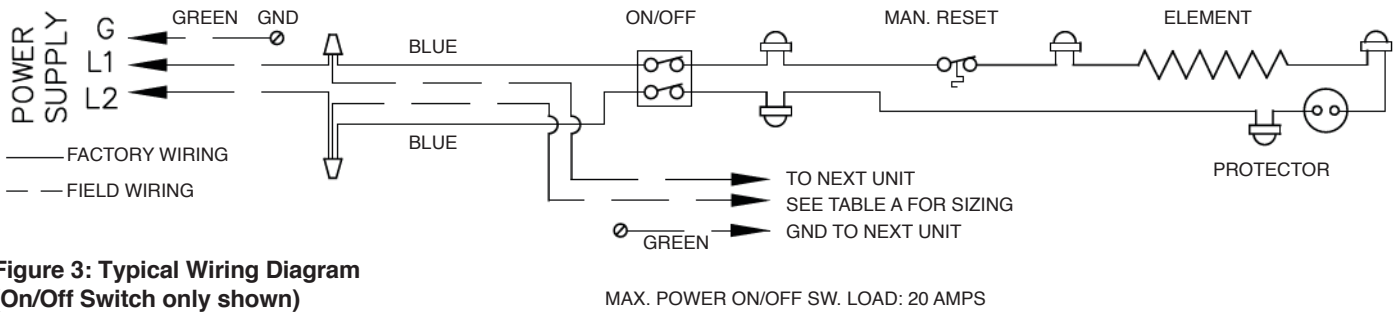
Typical Wiring Diagram (On/Off Switch only shown)
